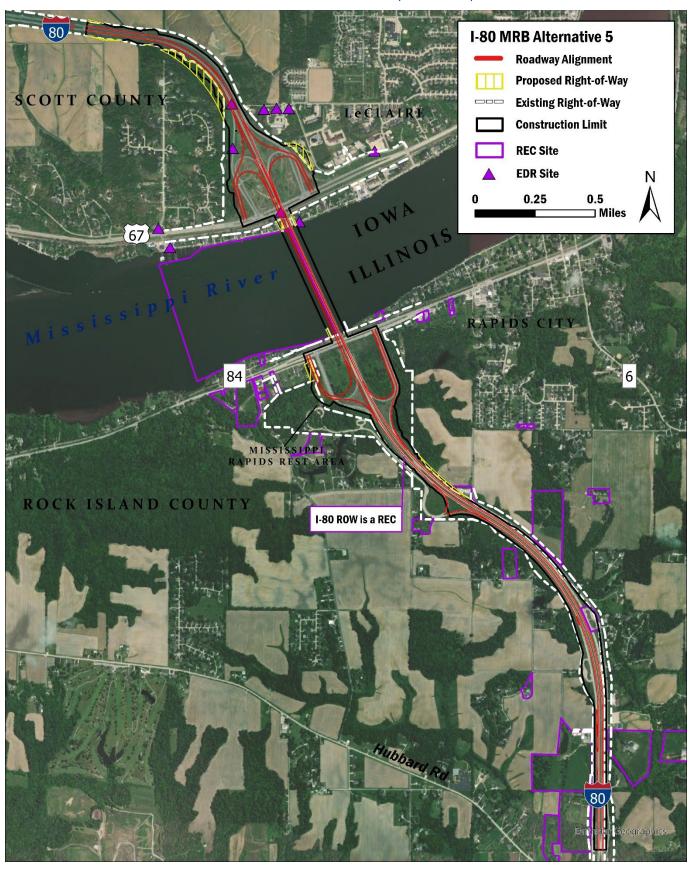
ALTERNATIVE 5 - NEW COMPANION BRIDGE WEST AND REPLACE EXISTING (SPECIAL WASTE)
